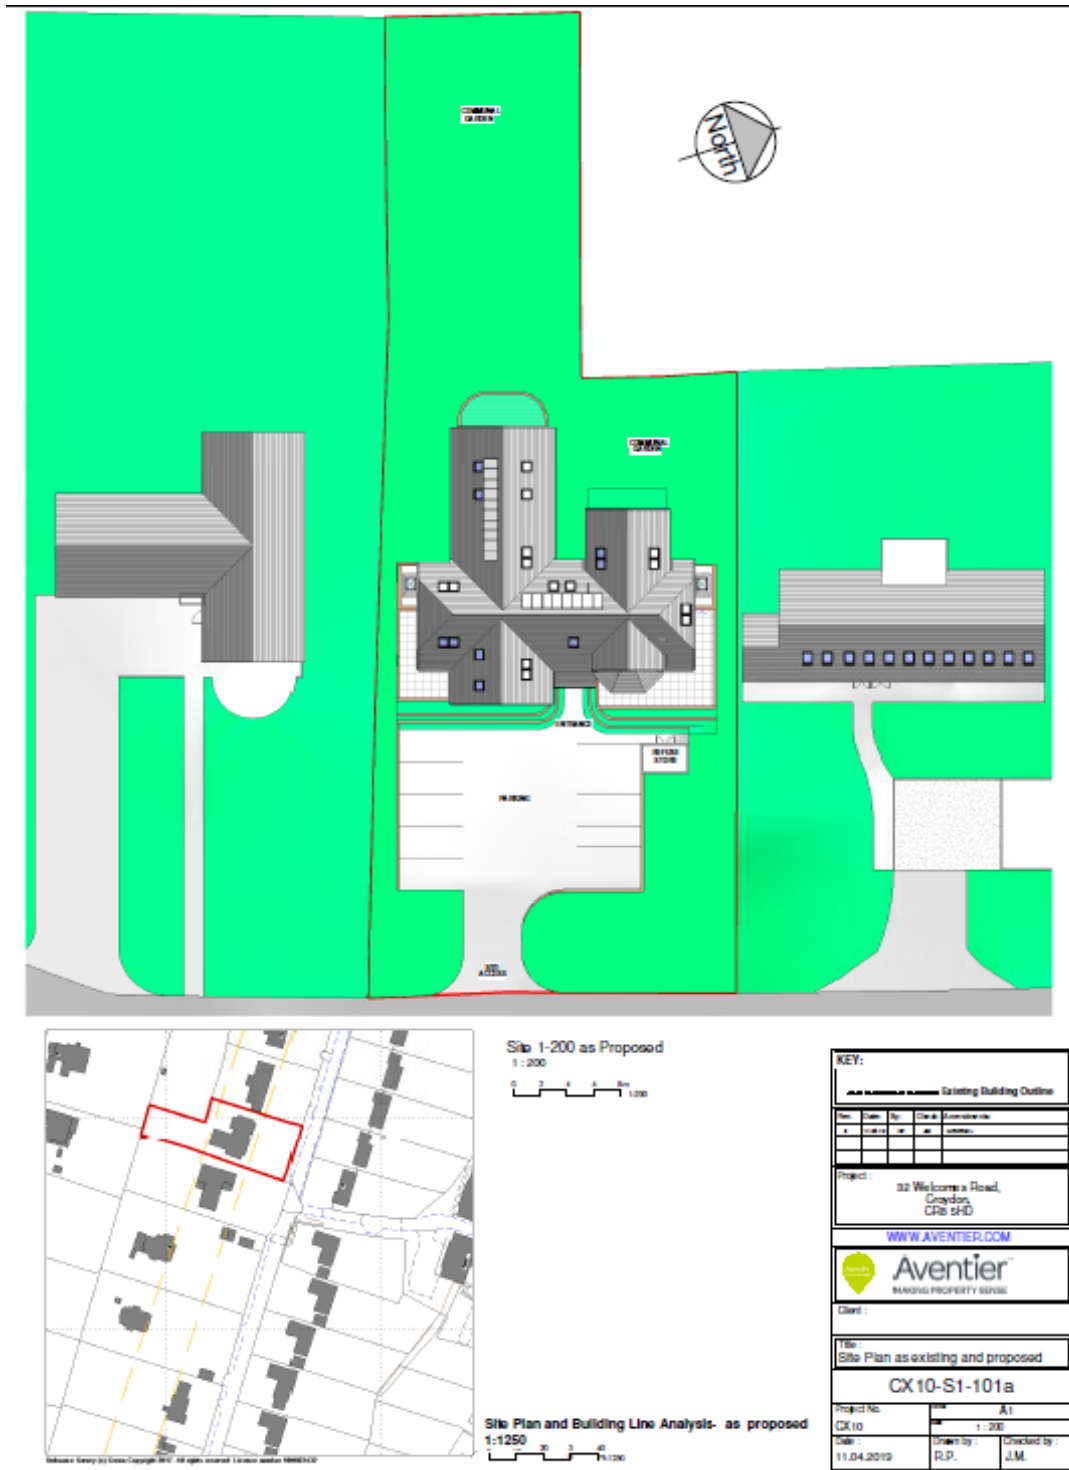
Proposed site plan showing proposal in relation to neighbouring properties
